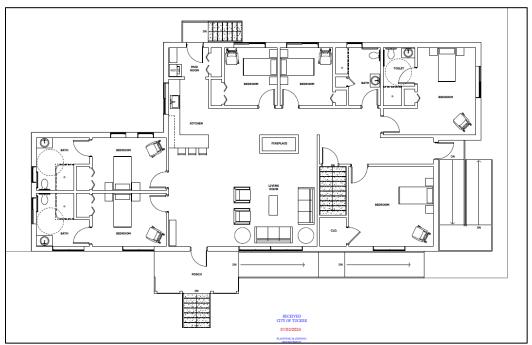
Proposed Floor Plan for 4372 Lawrenceville Highway.
